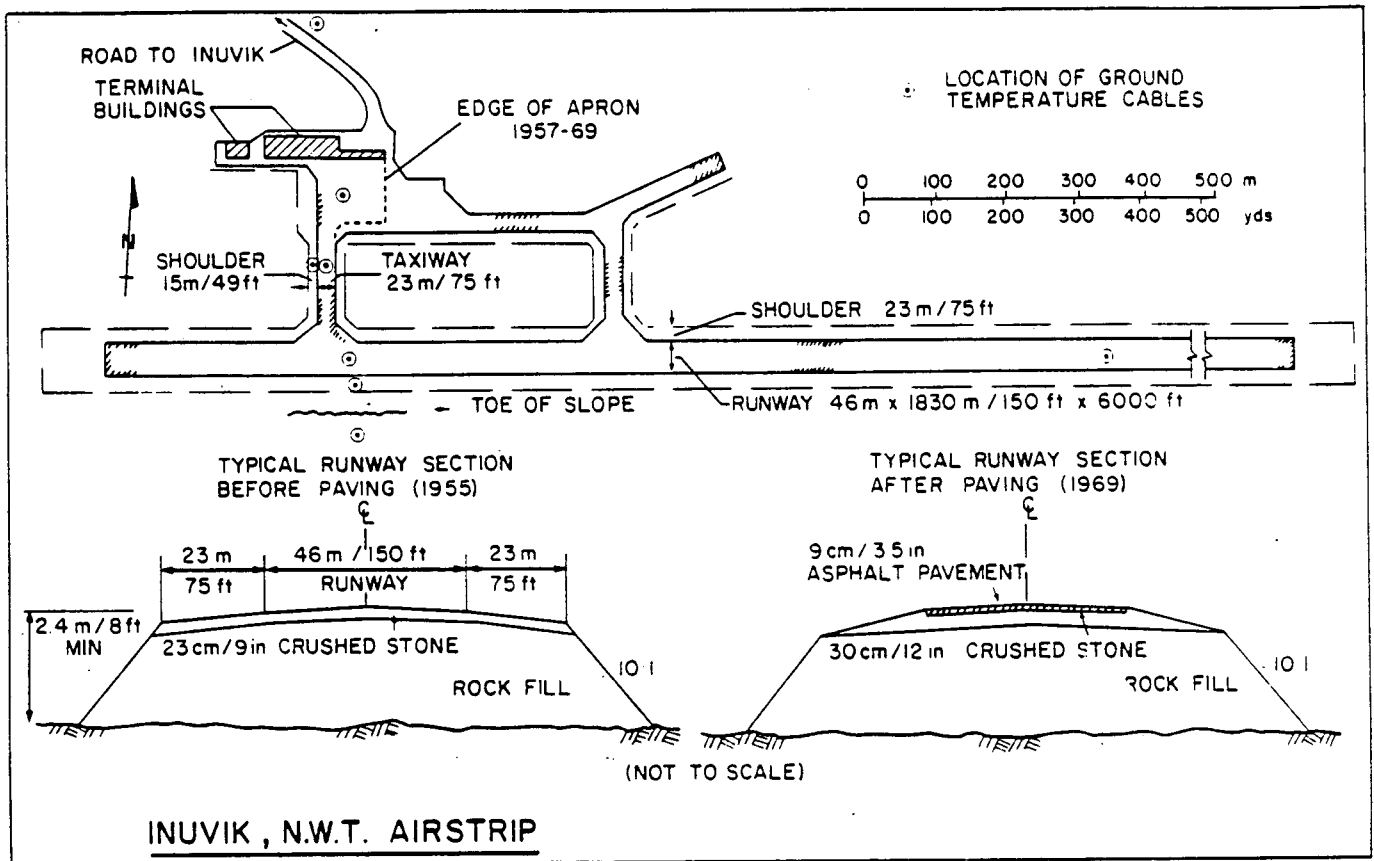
Plan showing the general layout of the Inuvik airstrip and typical sections of the runway before and after paving (Johnston, 1982).
